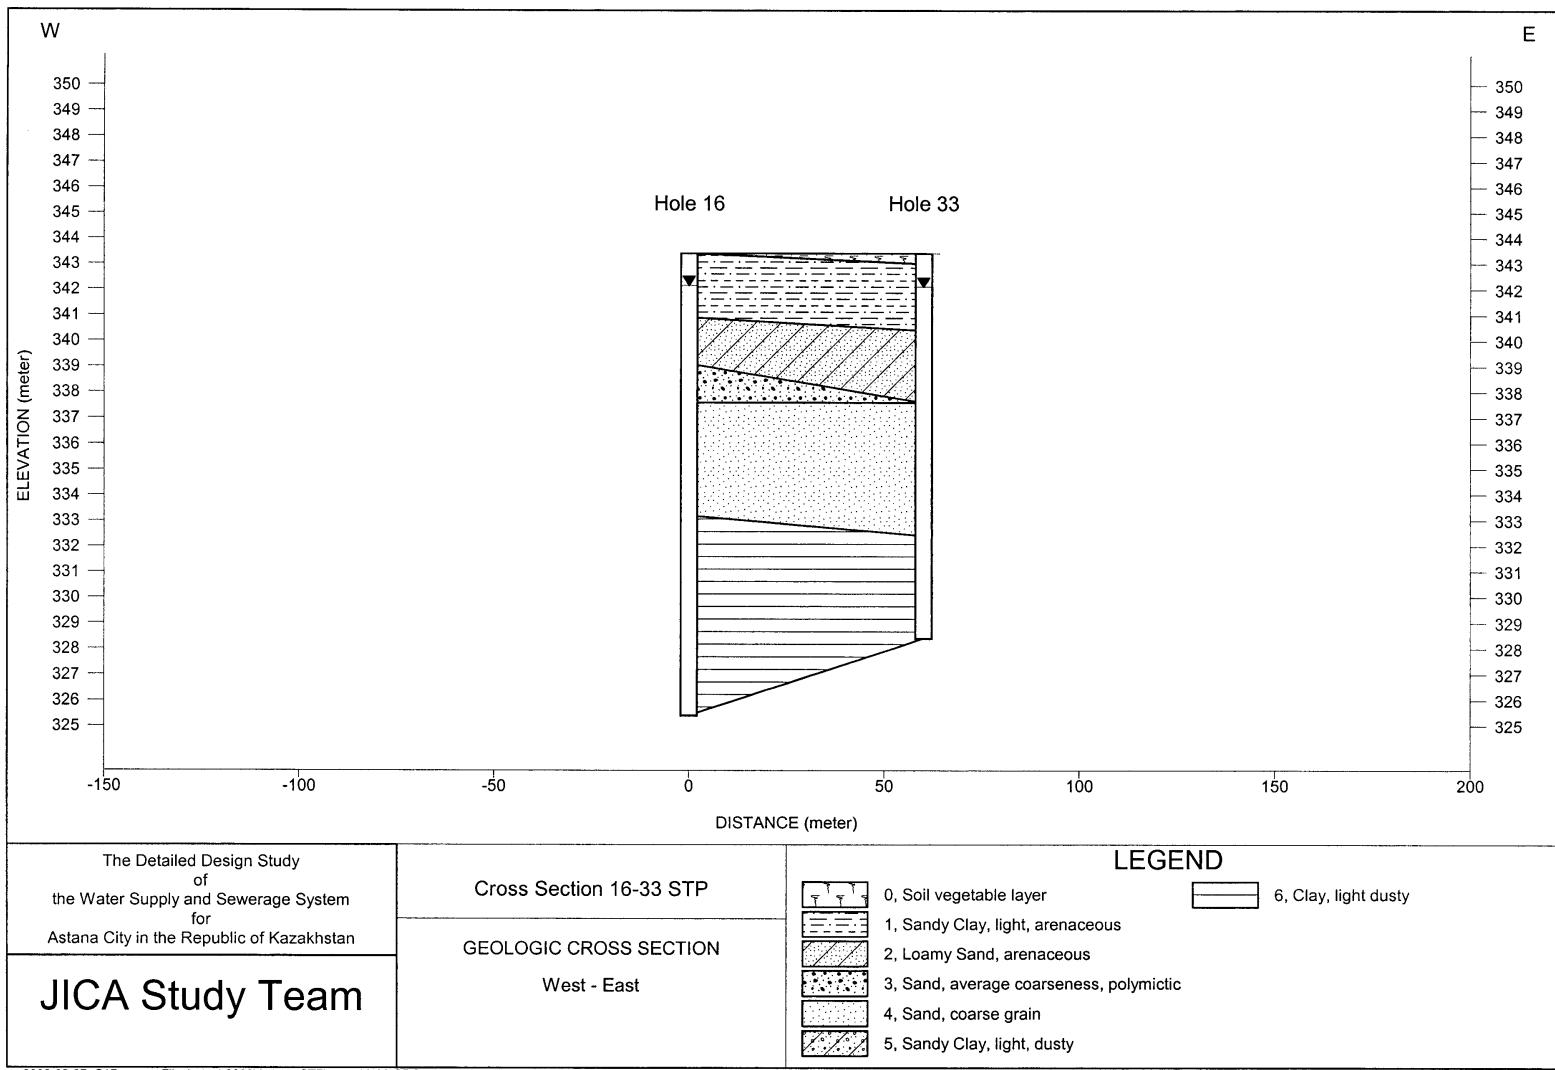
(4) Geological Cross Section at Sewerage Treatment Plant (4/9, Line No. 16-33)
